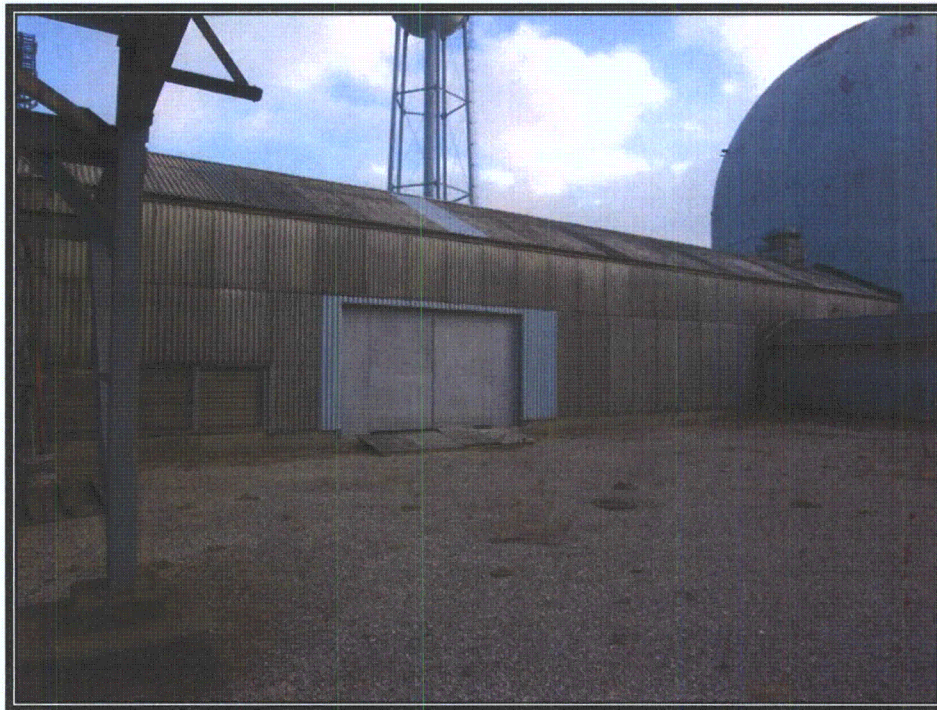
West wall of trestleway showing opening (Photograph by RCG&A, 2008)
